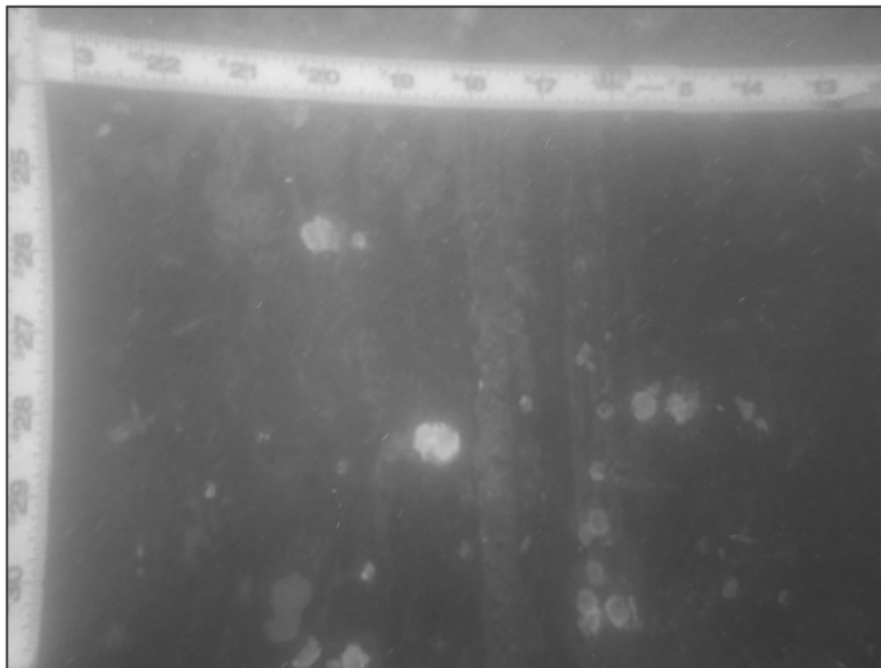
Typical Underwater Condition of 2000s Steel (Coating Intact)
